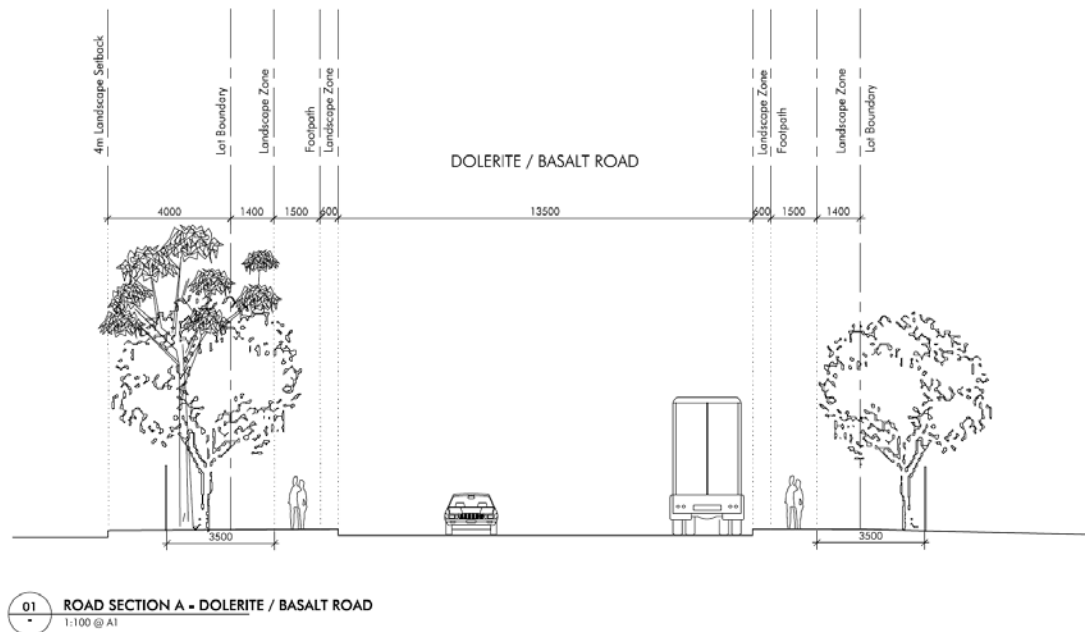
Dolerite Road / Basalt Road Typical Cross Section (Source: Nettleton Tribe)
